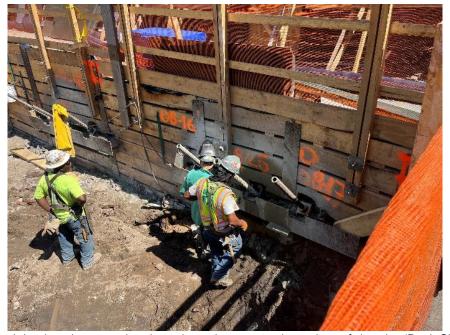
CCJV welding tieback rods to steel walers along the eastern boundary of the site (Peck Slip) (facing northeast)
